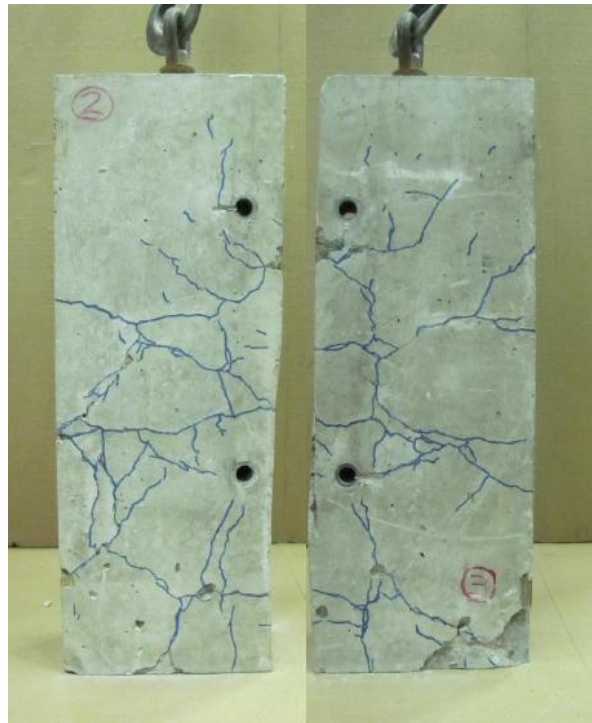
Concrete Crack Pattern for Panel 1 of Specimen SL S-0
